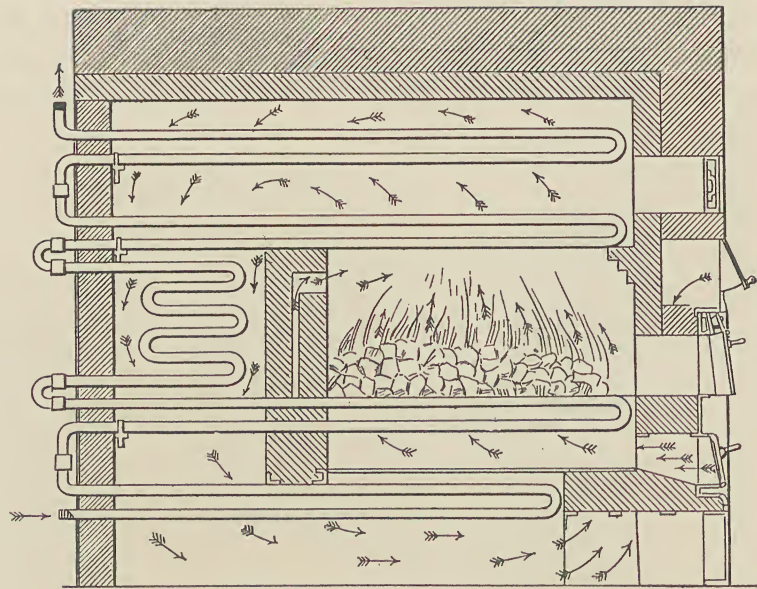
Section of the "Renton Gibbs" Tubular Boiler.
